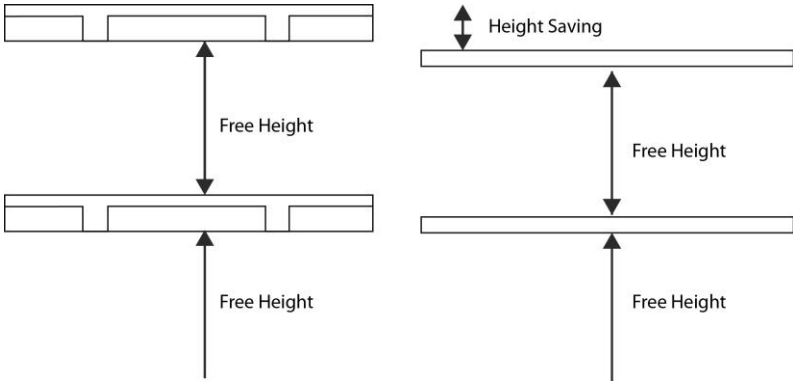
reinforced concrete floor and post-tensioned slab (Source: author, 2015)
